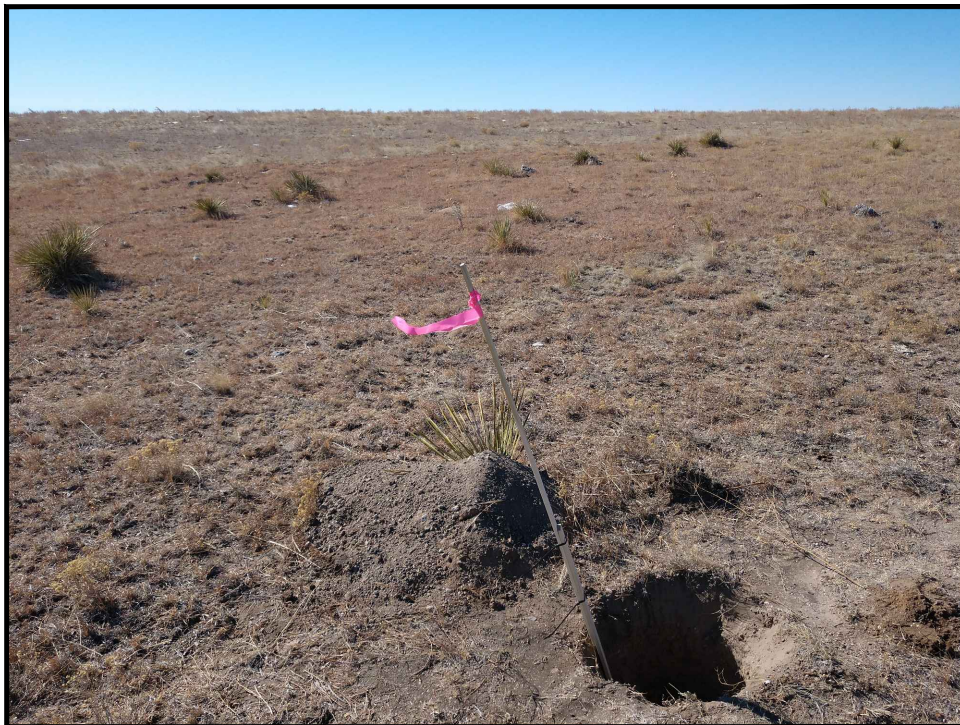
PHOTO: VIEW OF AS-DRILLED LOCATION CAMERA ANGLE: WESTERLY
